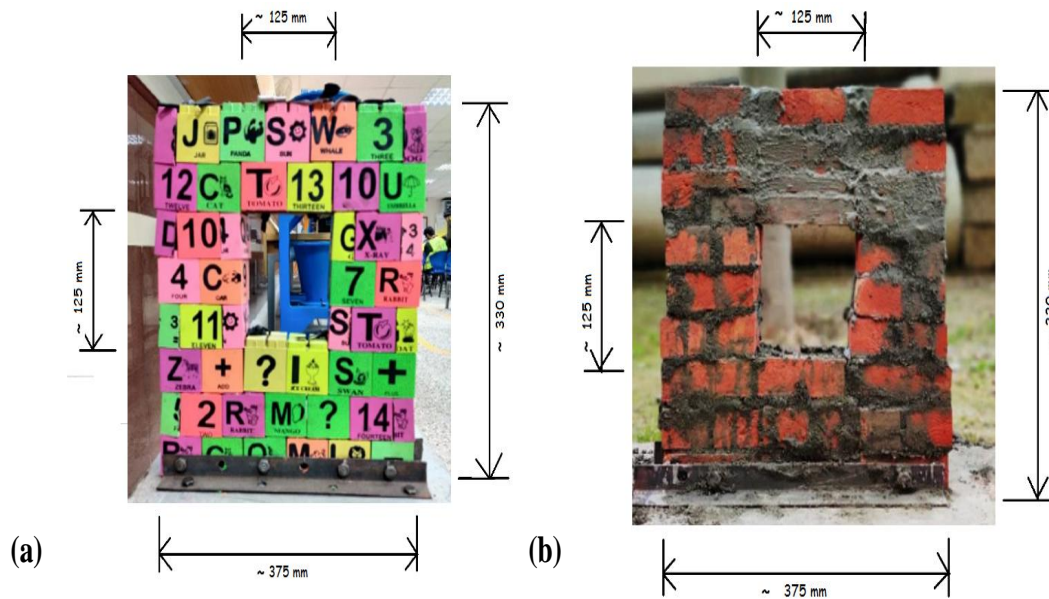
Prototype a) interlocking plastic block wall with opening, b) unreinforced brick masonry wall with opening
